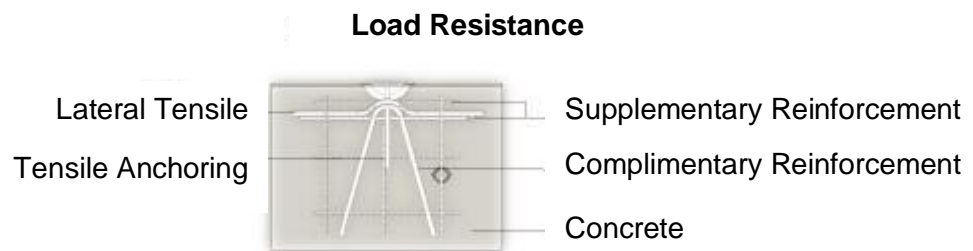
Load resistance elements of an anchor system in a wall panel,
